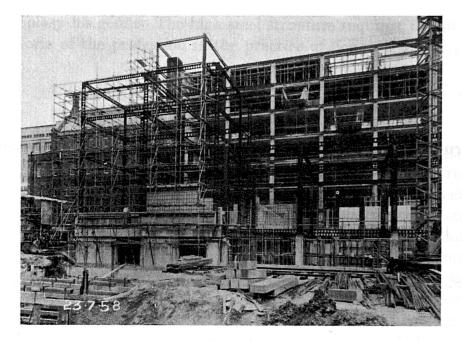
Mechanical Engineering. Building Stage 1. Imperial College.
